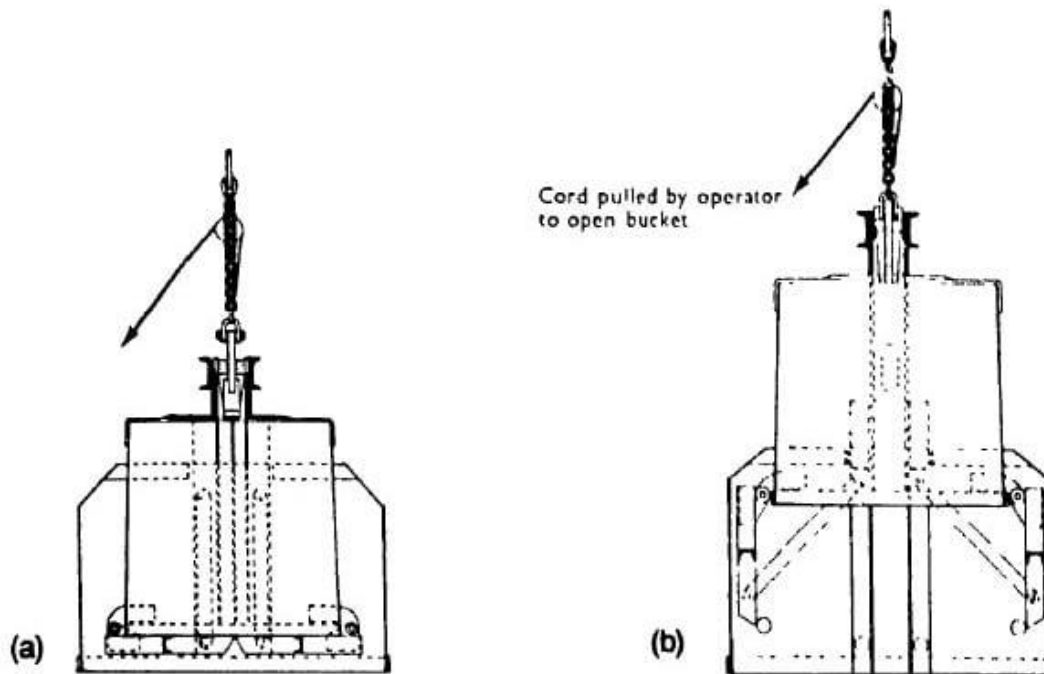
Skips for Underwater Concreting (a) Closed and (b) Opened
